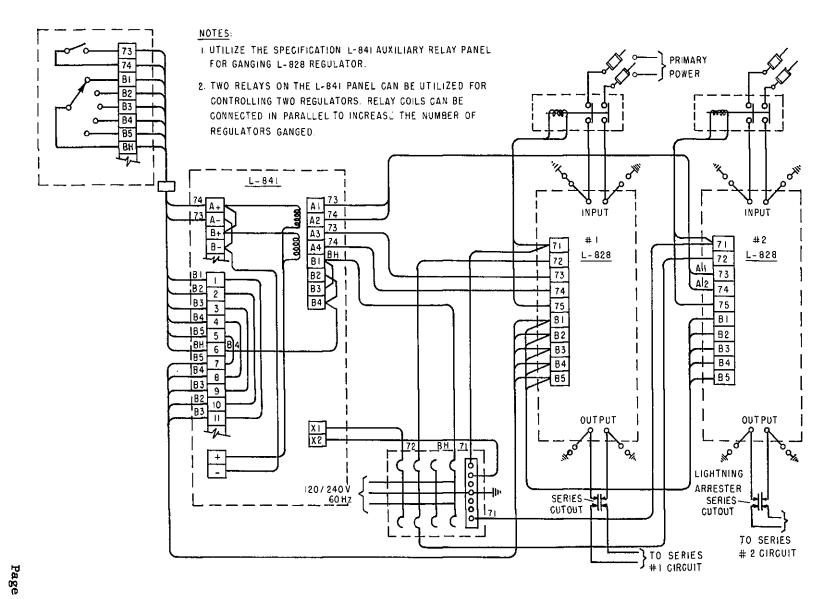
TYPICAL DETAILS FOR GANGING L-828 STEP-TYPE REGULATORS
